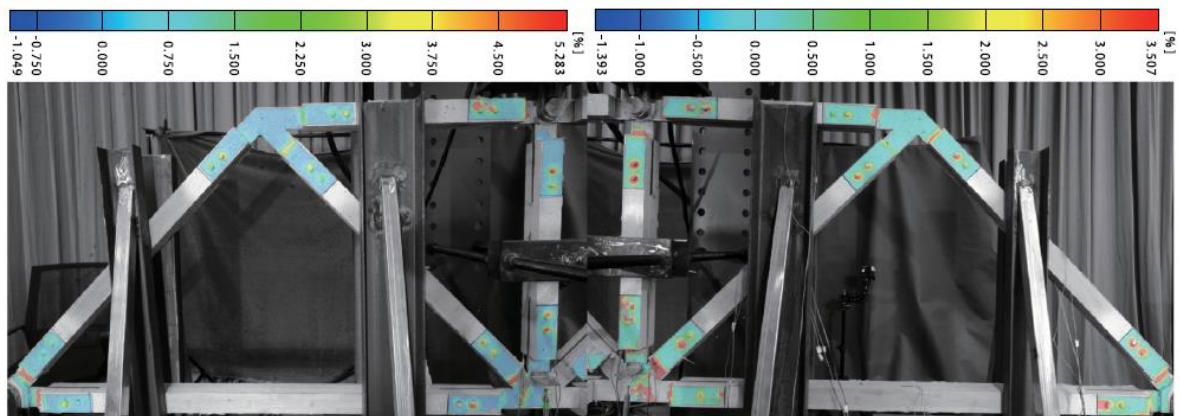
Stress Field of Steel Insert-Plate Glubam Warren Truss under Hysteretic Loading
